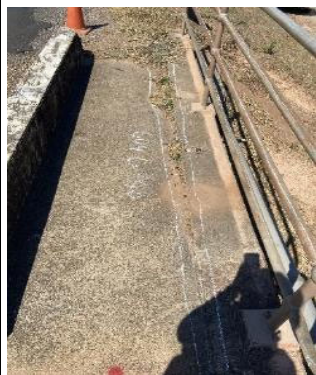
Component	Others	Photo No.	202	Component	Road surface
